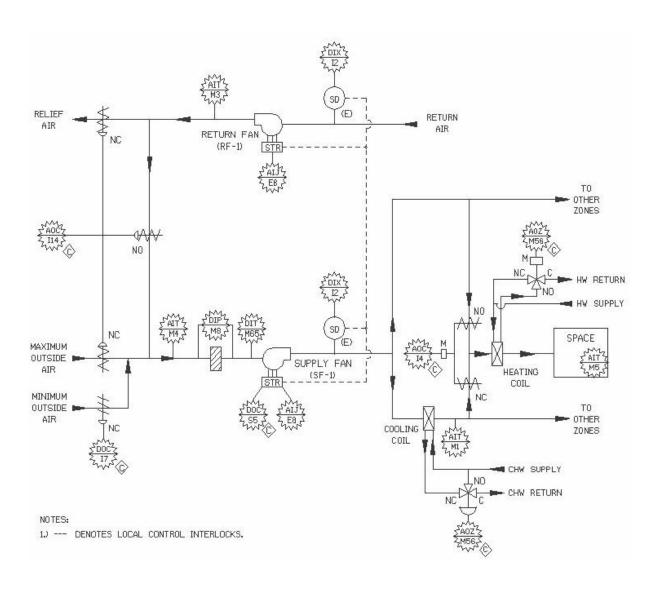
Bypass Multi-Zone Air Handling System with Hot Water and Chilled Water Coils.
